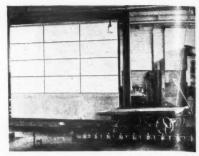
The wall assembly used for vibration and impact tests. The platform barrow and ramp are shown arranged to give a glancing blow
